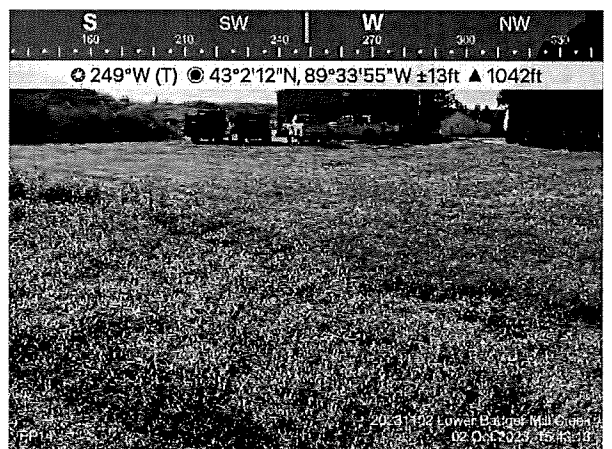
Photo point 14, view WSW toward area of encroachment by adjacent business
